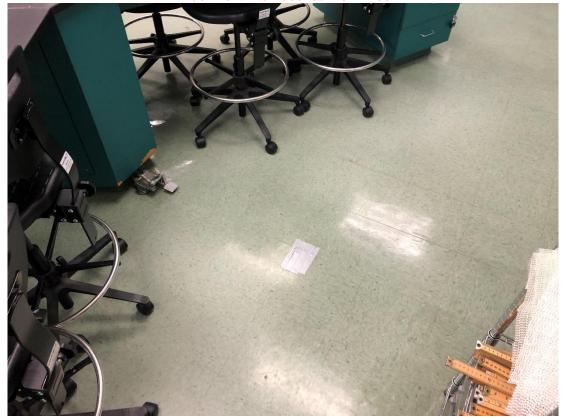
Building 400 / Room 402, Concrete Slab under Vinyl Floor Tile.
